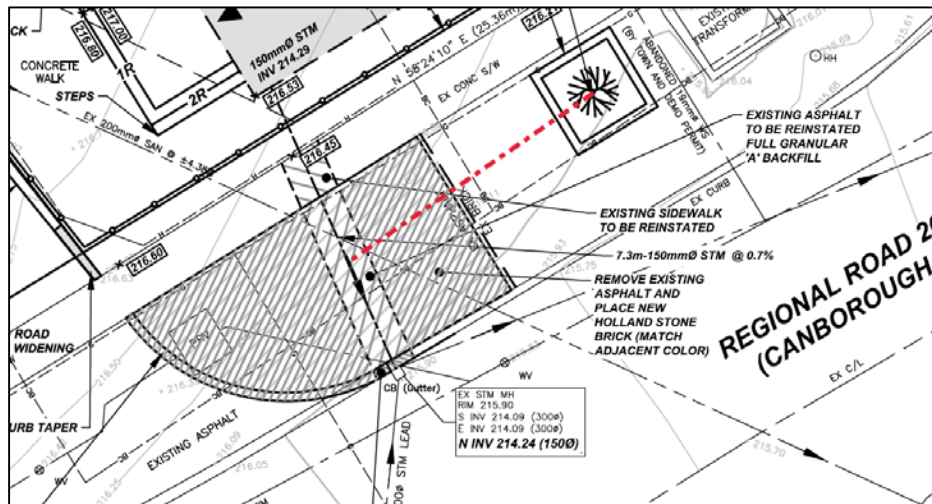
Depending upon existing soil conditions, the tree pit may require a drainage connection to the nearest catch basin:
